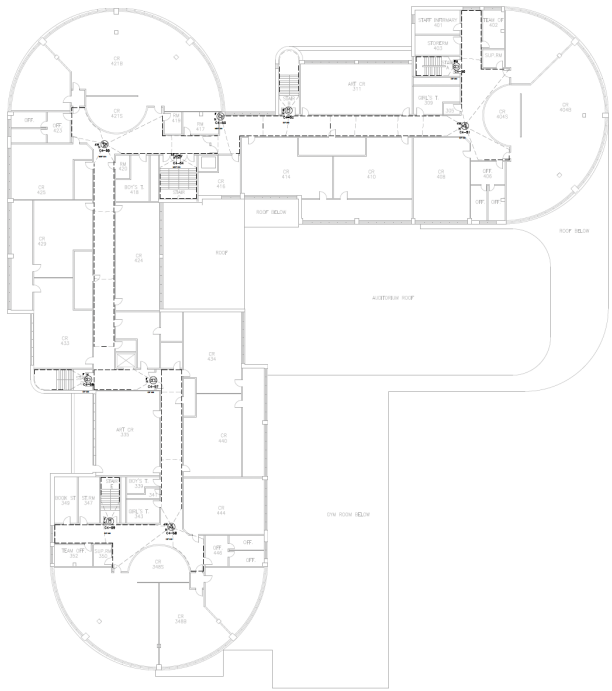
I.S. 131 Floor Plans - 4th Floor, Source: School Alteration Files
